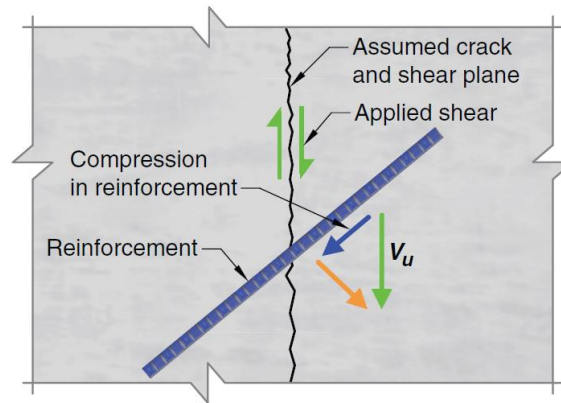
Compression in reinforcement where shear friction does not apply,
